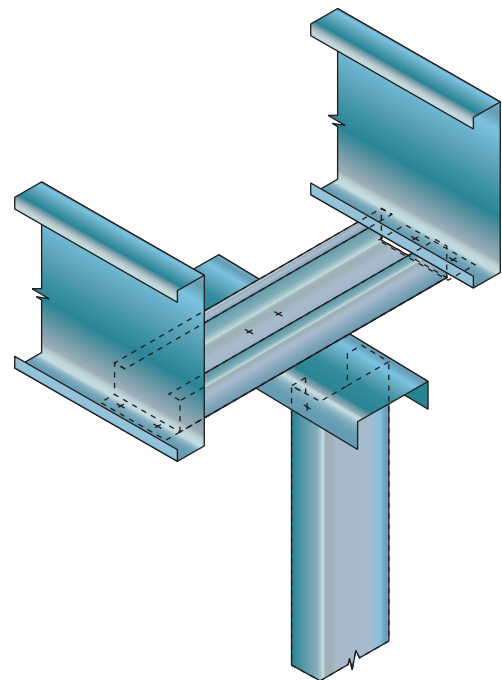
Metal Blocking Track or Stud Blocking material between joists is used when the wall is parallel to the joists or trusses.
